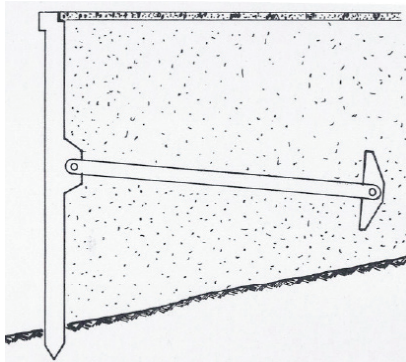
Cross-section of quay wall port of Niteroi , Brazil 1929 [Santo Reis and de Bosolo, 1989]
